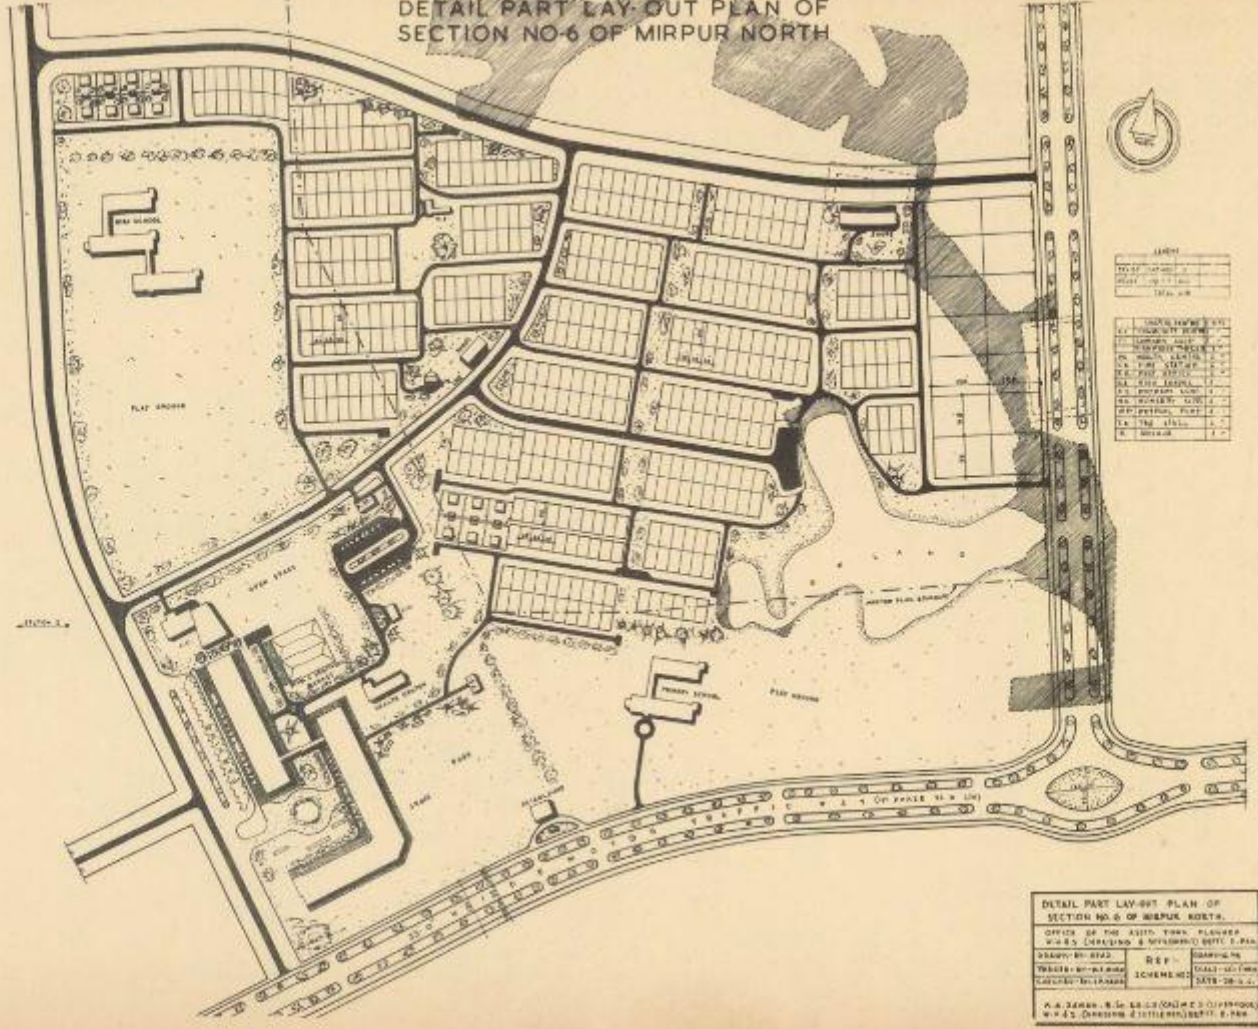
DETAIL PART LAY-OUT PLAN OF SECTION NO-6 OF MIRPUR NORTH
